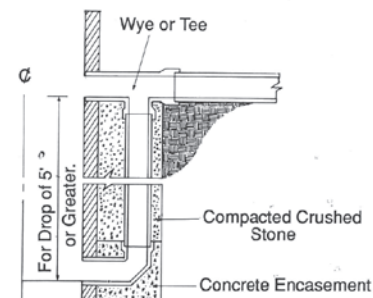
Typical Drop Manhole (for 5 ft. or greater)
